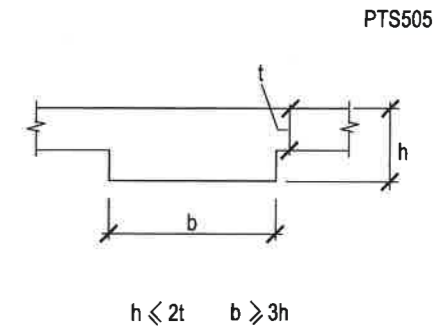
View of a Slab Band Extending Over the Long Spans (P283)
